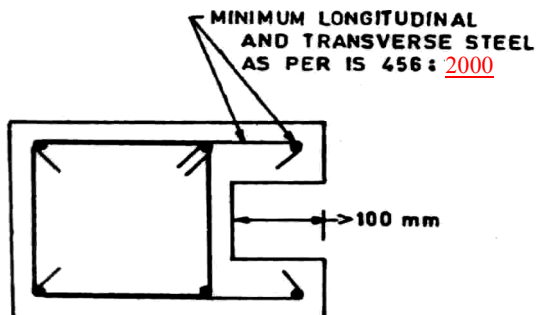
Reinforcement requirement for column with more than 100 mm projection beyond core
